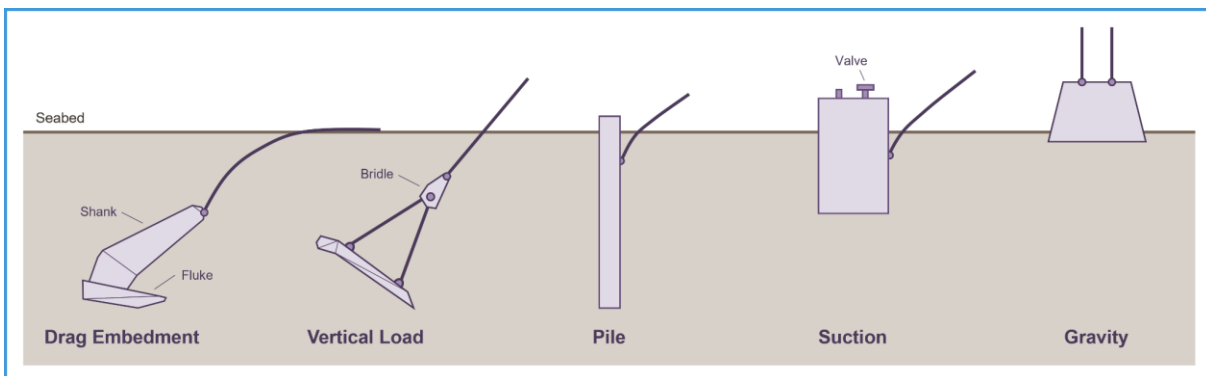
Overview of Typical Floating Foundation Anchor Types (not to scale).
